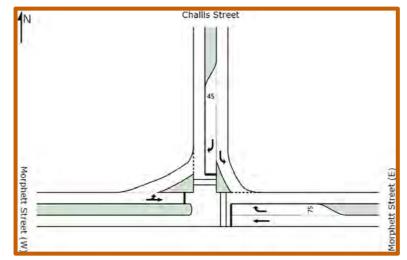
Recommended Layout for the Intersection of Morphett Street and Challis Street
